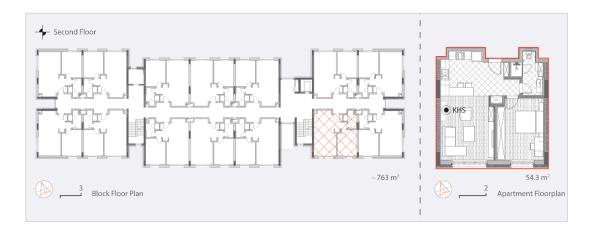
Block and apartment floor plans of post-2000 buildings, and location of KHS within residential setting (Illustration by the author, 2022).
